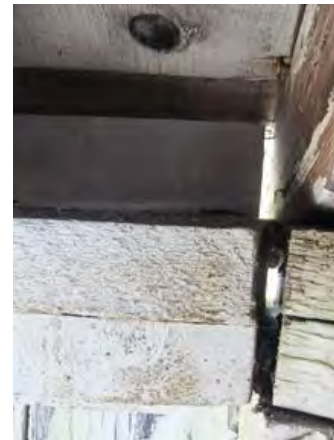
Separation at Double Top Plate at Main Perimeter Wall
